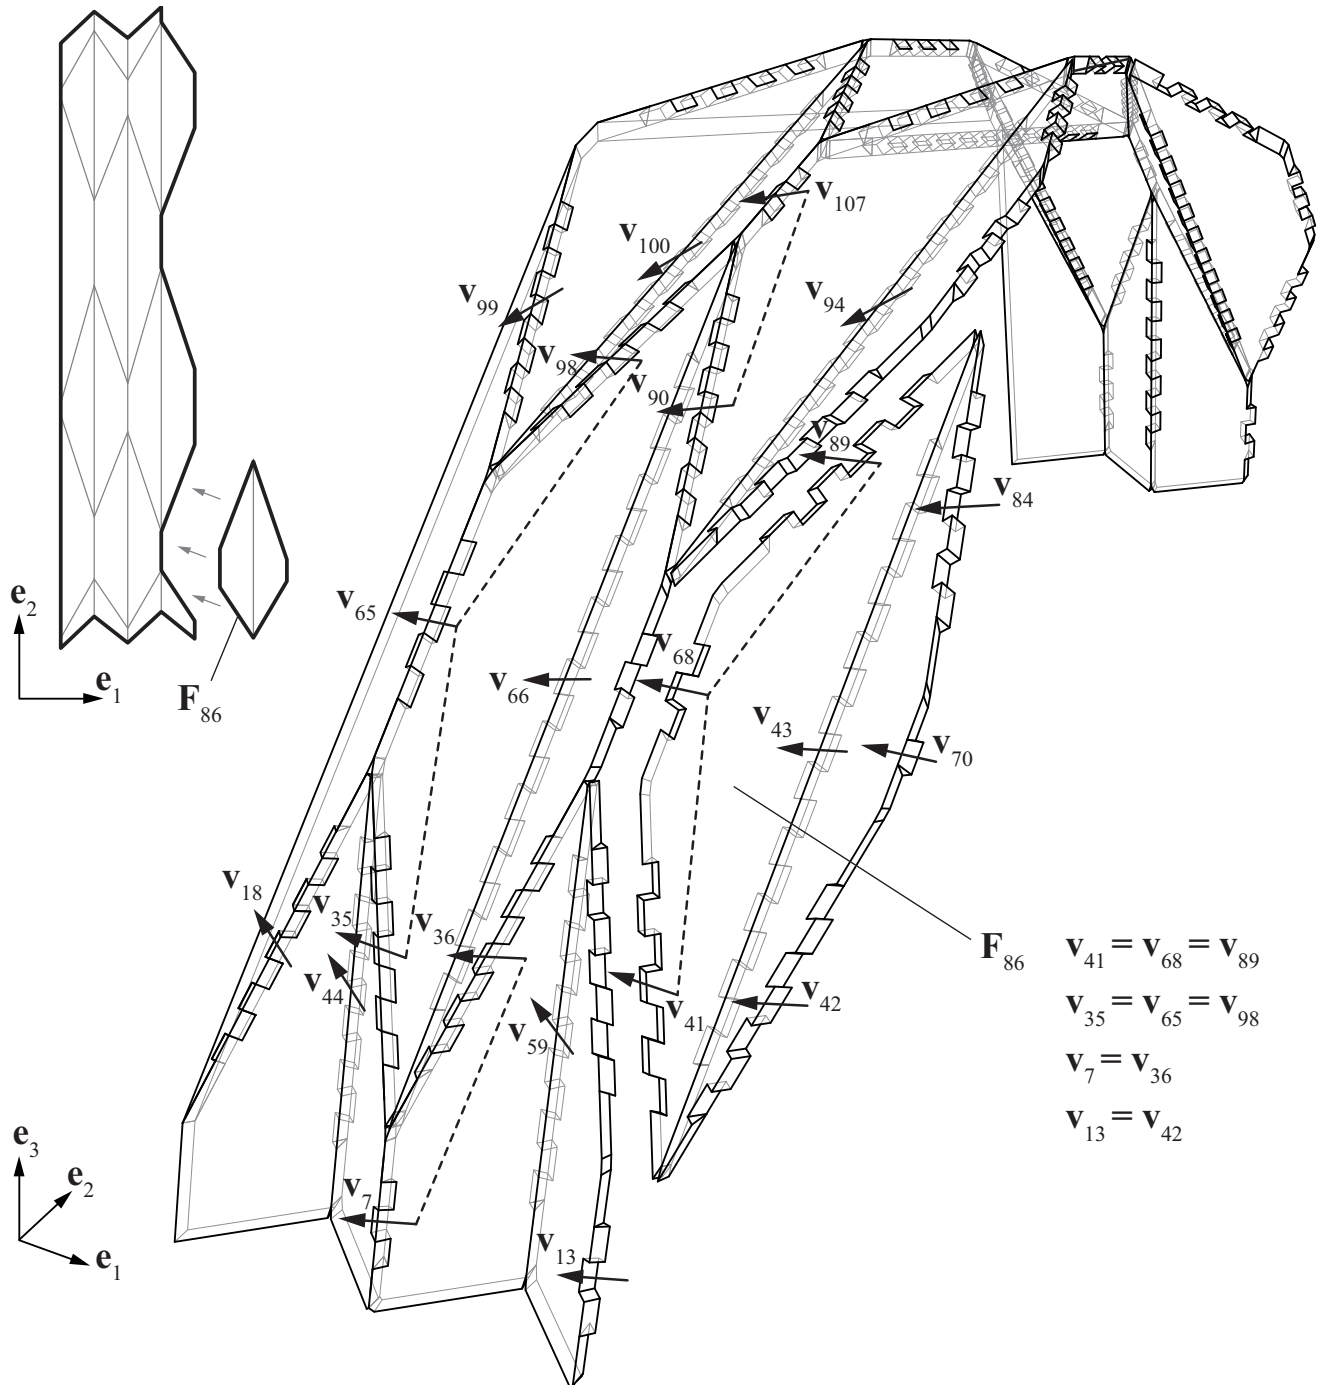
Left-to-right assembly of the Interlocking folded plate shell prototype. Built from Kerto-Q structural grade LVL panels (7-layer, I-III-I).
